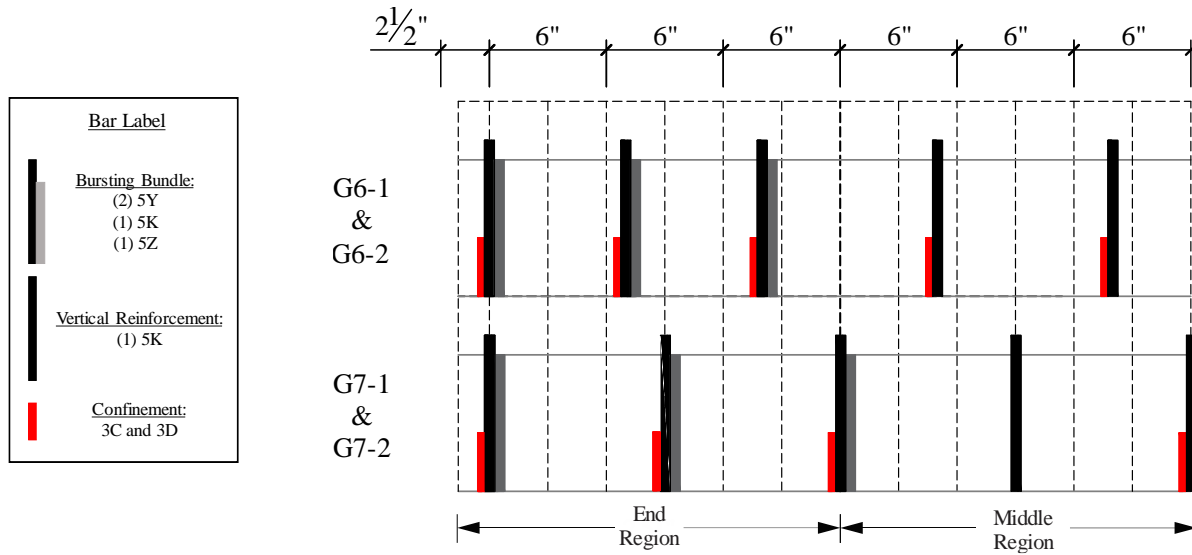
Reinforcement detailing used in FIB 54 G6 and G7
